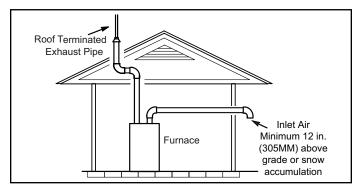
Exiting Exhaust and Intake Vent (no common pressure zone)
